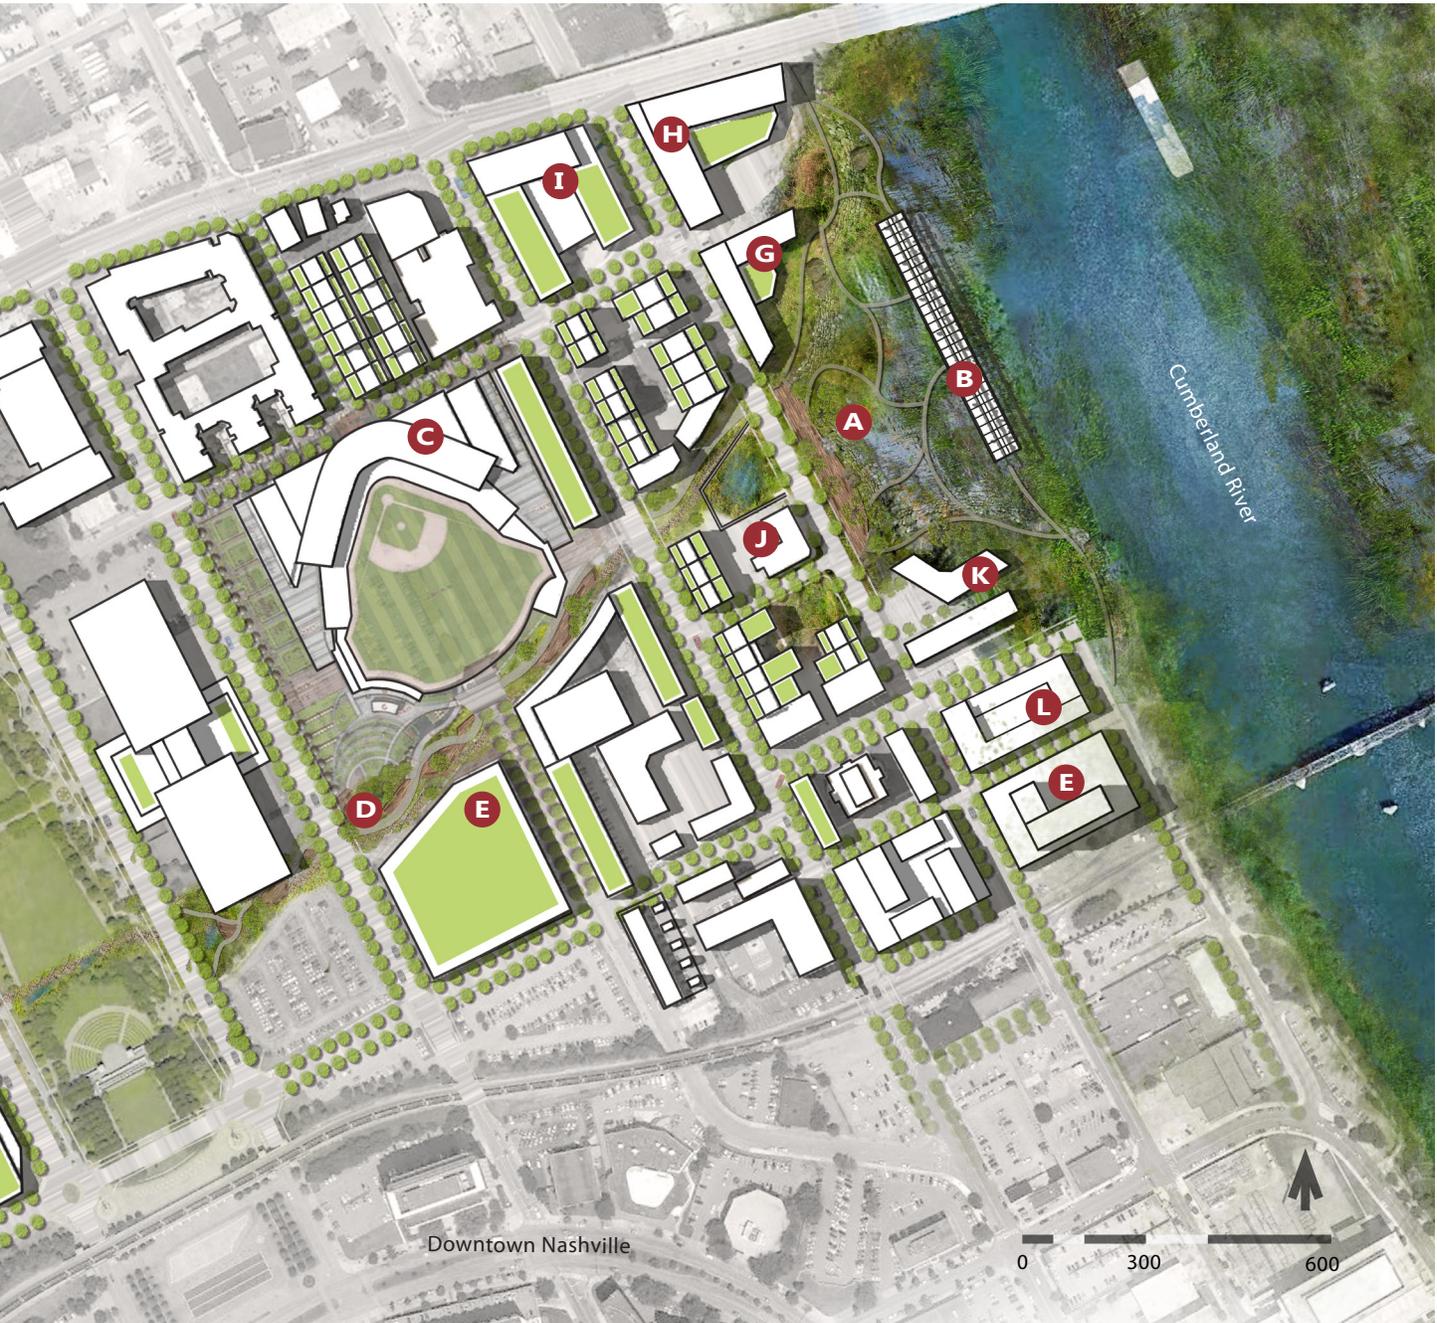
The Lower Dell Site Plan (ULI Team 142356 2014) ▶
